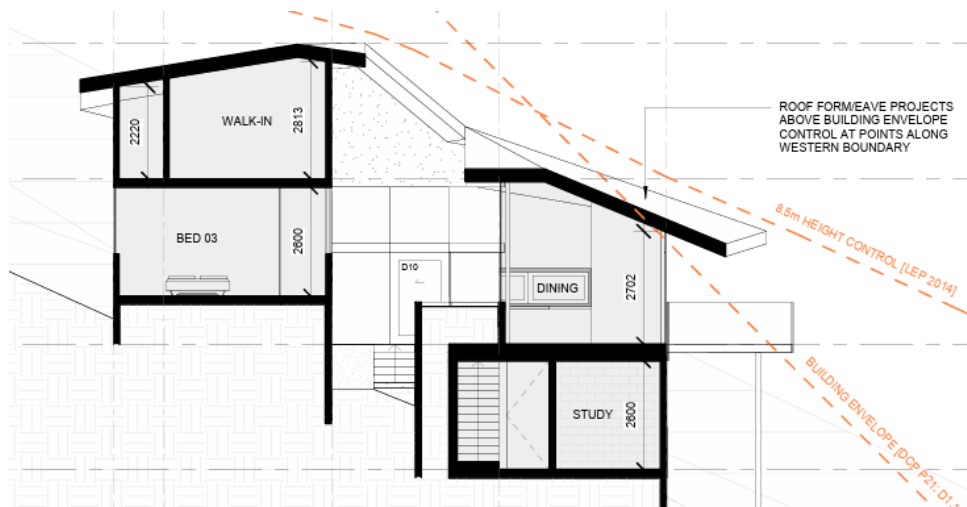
Extent of building envelope non-compliance on cross-section (source: Drew Heath Architects)
